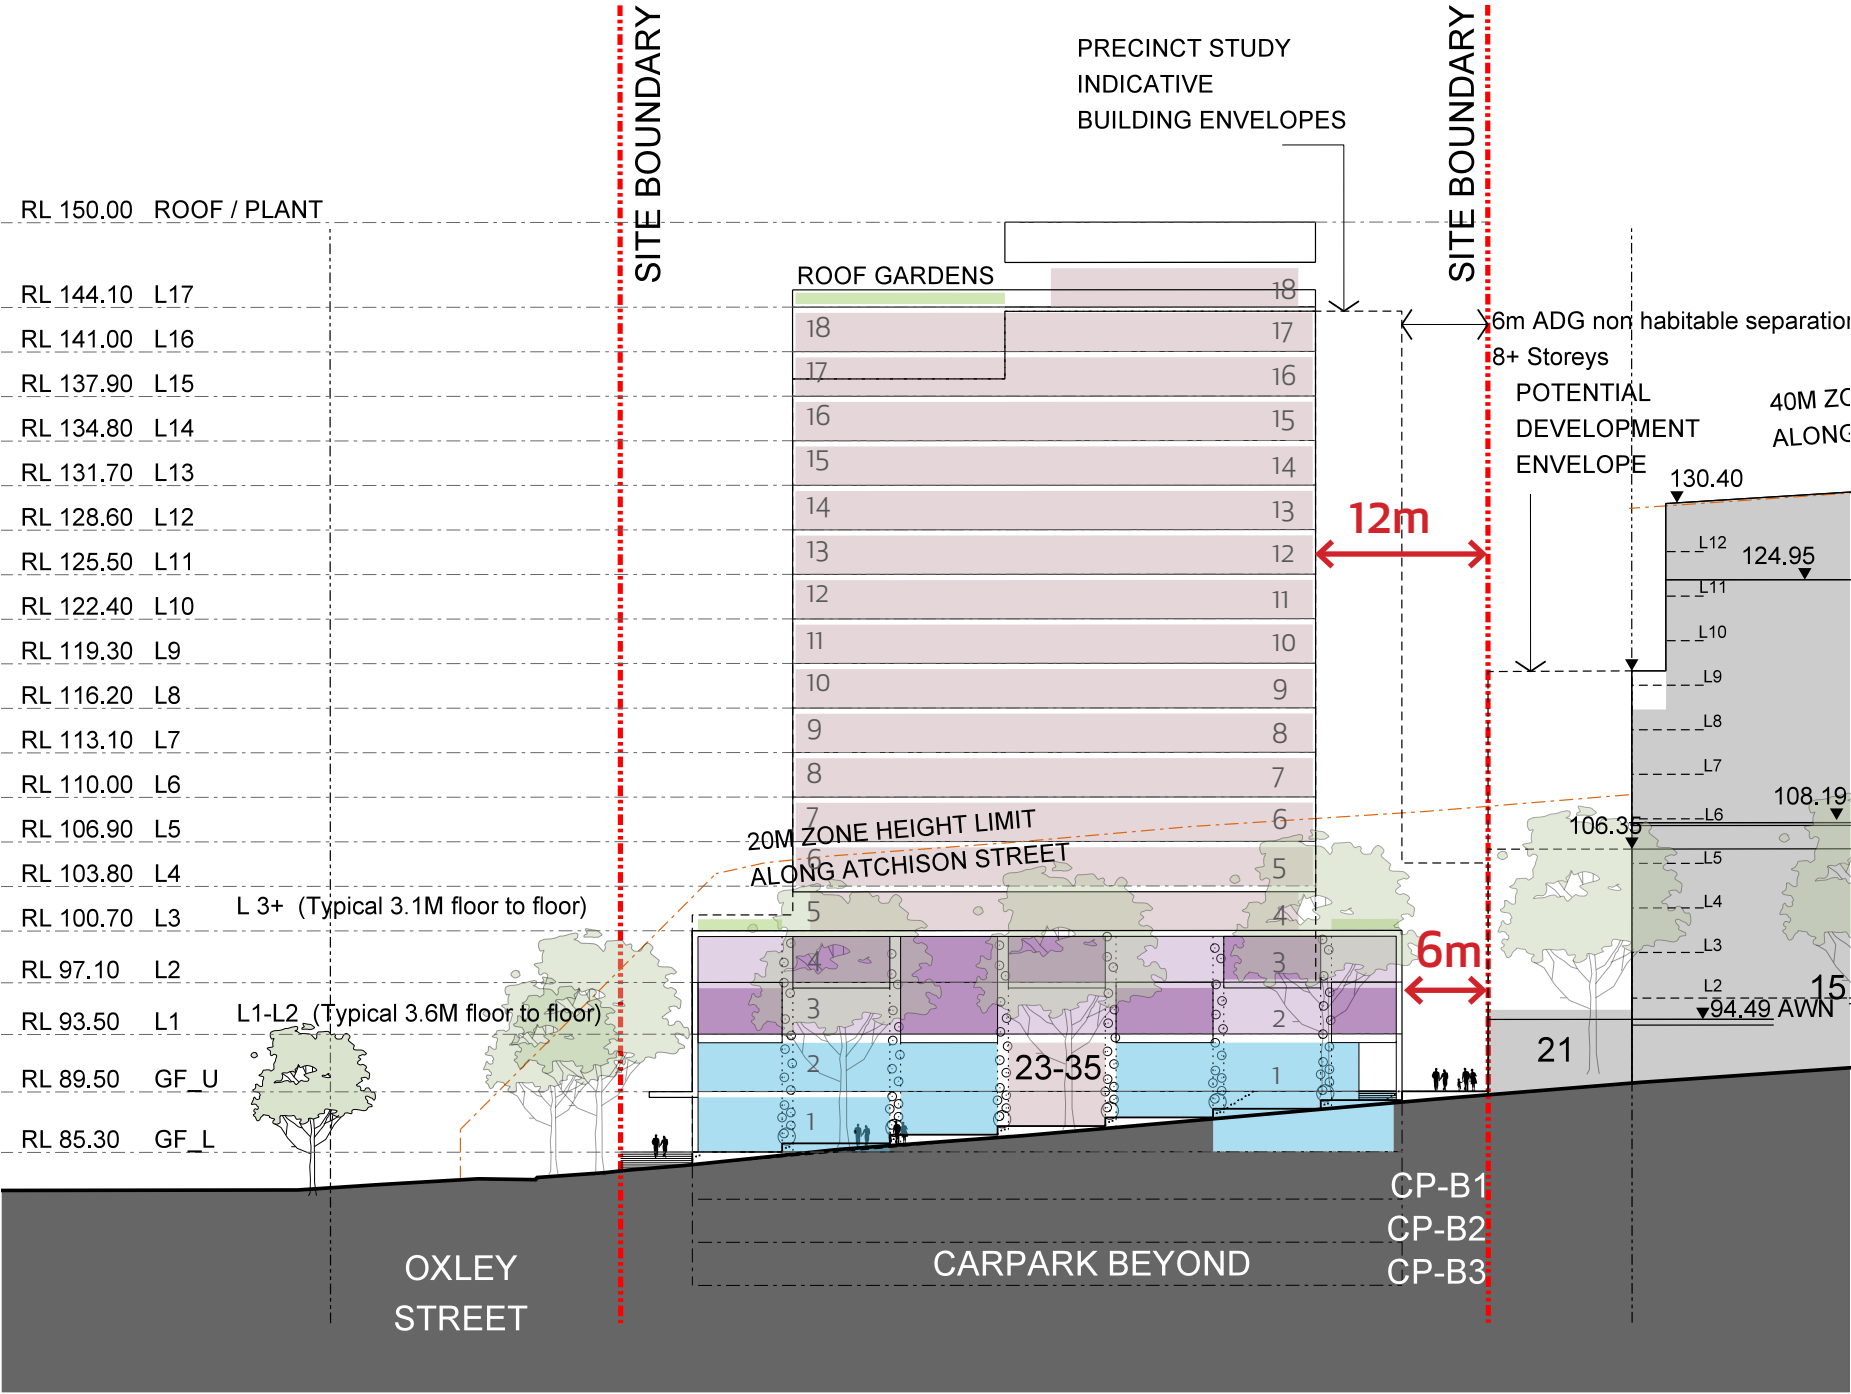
Building Envelope Section / Atchison Street Elevation
